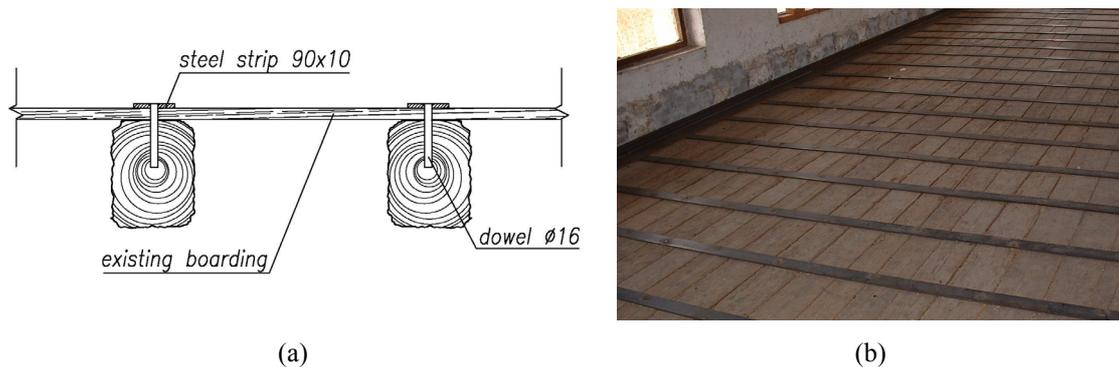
Strengthening technique: (a) cross section, (b) stiffened floor example.
